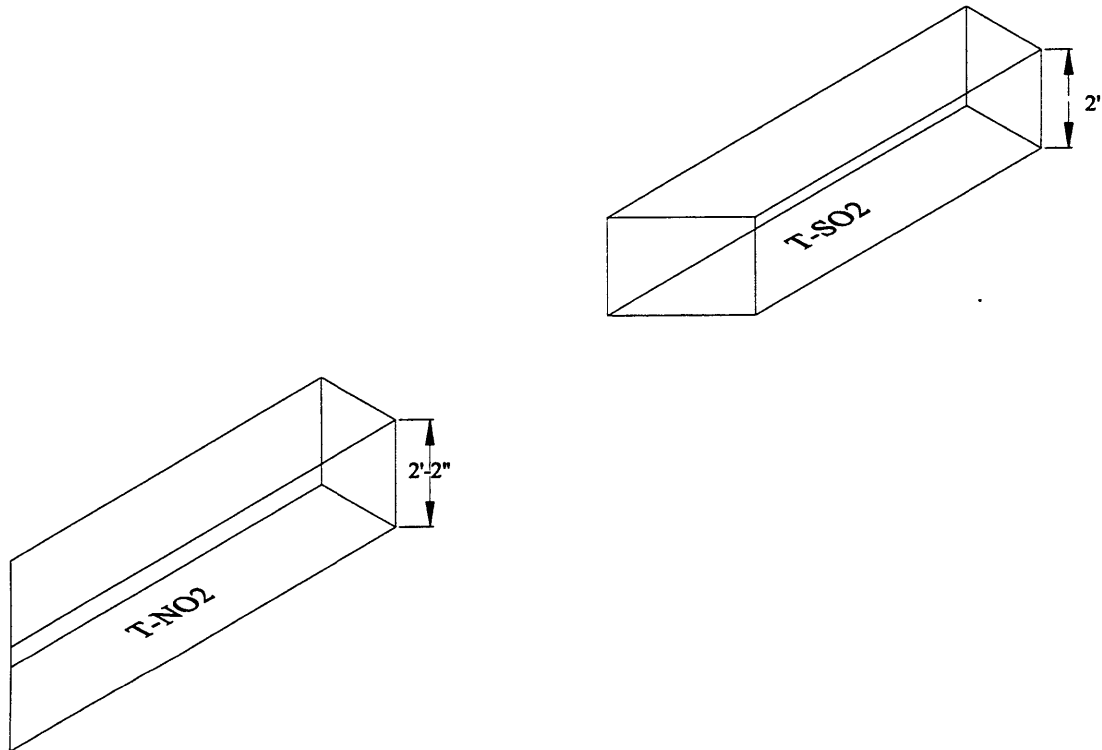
Side views of spacer blocks T-NO2 and T-SO2. T-SO2 will be attached to SO-2 to extend the existing block and prevent streaming.
